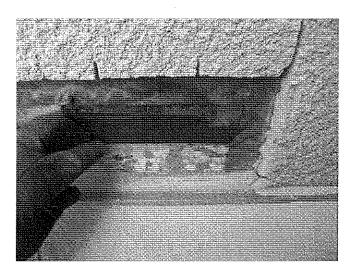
/ Front elevation cement stucco termination at horizontal lime stone cap.
